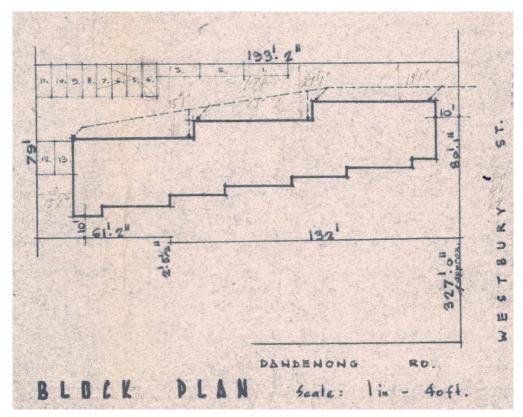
1960 drawings, Block Plan showing building footprint (Source: Building File)
